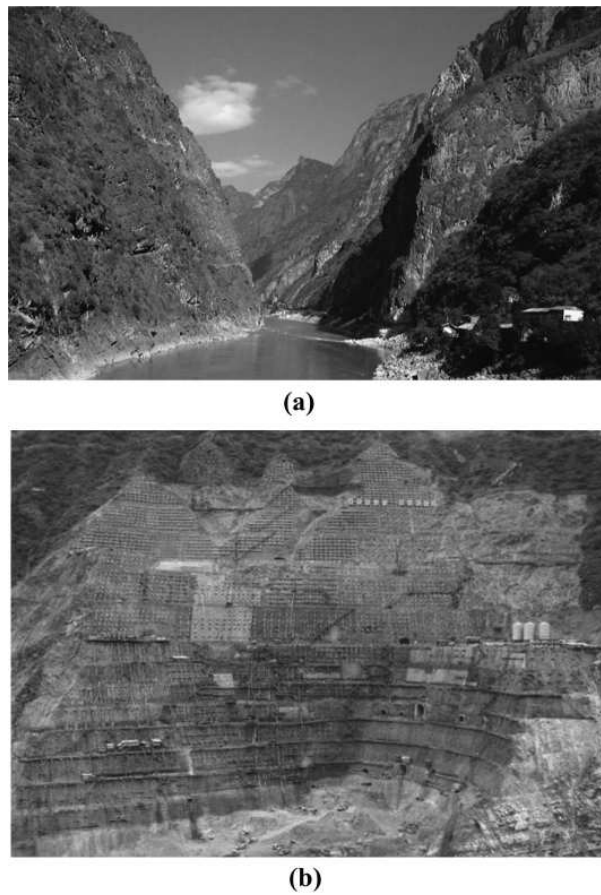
Geomorphic photograph of dam site: (a) before excavation, and (b) the left slope after excavation [13].
